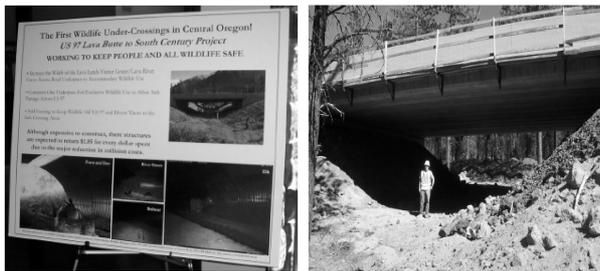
Example of Greenroads Construction : US 97: Lava Butte - S. Century Drive Section
